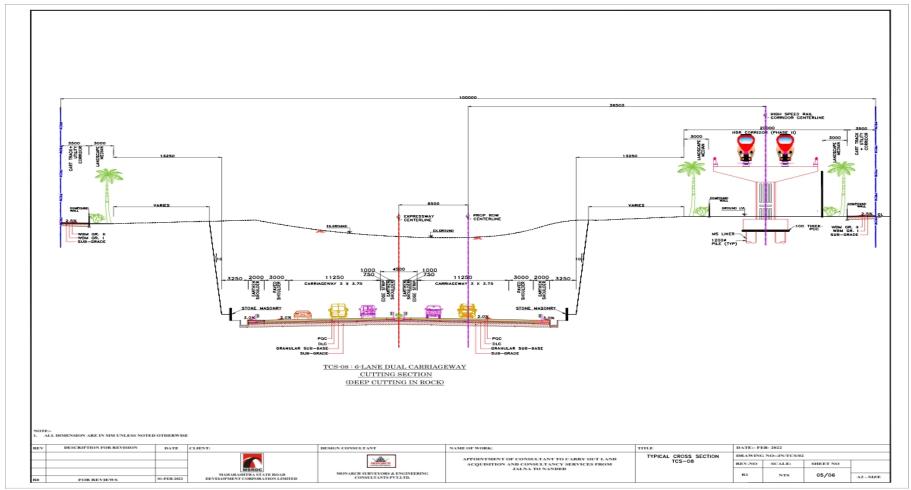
E: (Typ.) Cross Section of Proposed Alignment
